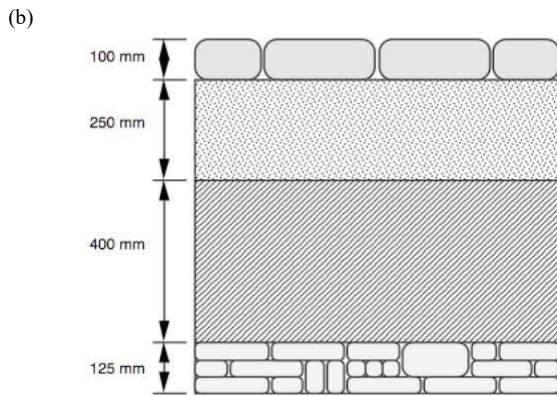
(a) Layers within a Typical Pavement and (b) Pavement Structure Thickness
